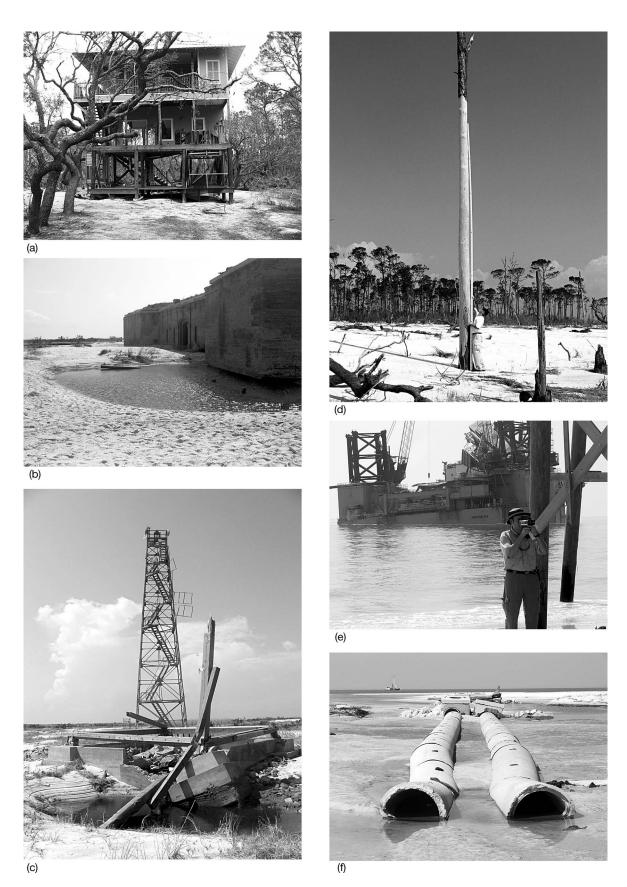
(a) Cat Island, MS: one of the two only houses that survived with severe washout damage and trimline on the second floor; West Ship Island, MS: (b) Fort Massachusetts with 15 m diameter scour hole; (c) scour hole with collapsed tower foundation; (d) East Ship Island, MS: High water mark based on the bark stripped off a slash pine tree (note the 7.65 m long survey rod for scale); Dauphin Island, AL: (e) rapid surveying of a transect using a laser range finder (background: Offshore oil platform that broke loose and drifted from Louisiana to Alabama); and (f) massive 0.7 m overwash erosion revealing pipes
